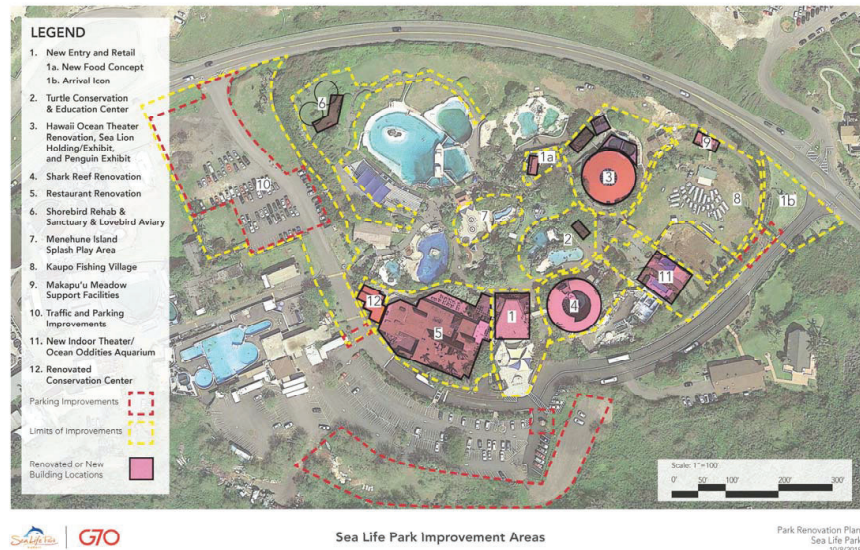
Plans for proposed renovations and improvement at Sea Life Park (courtesy of G70).
